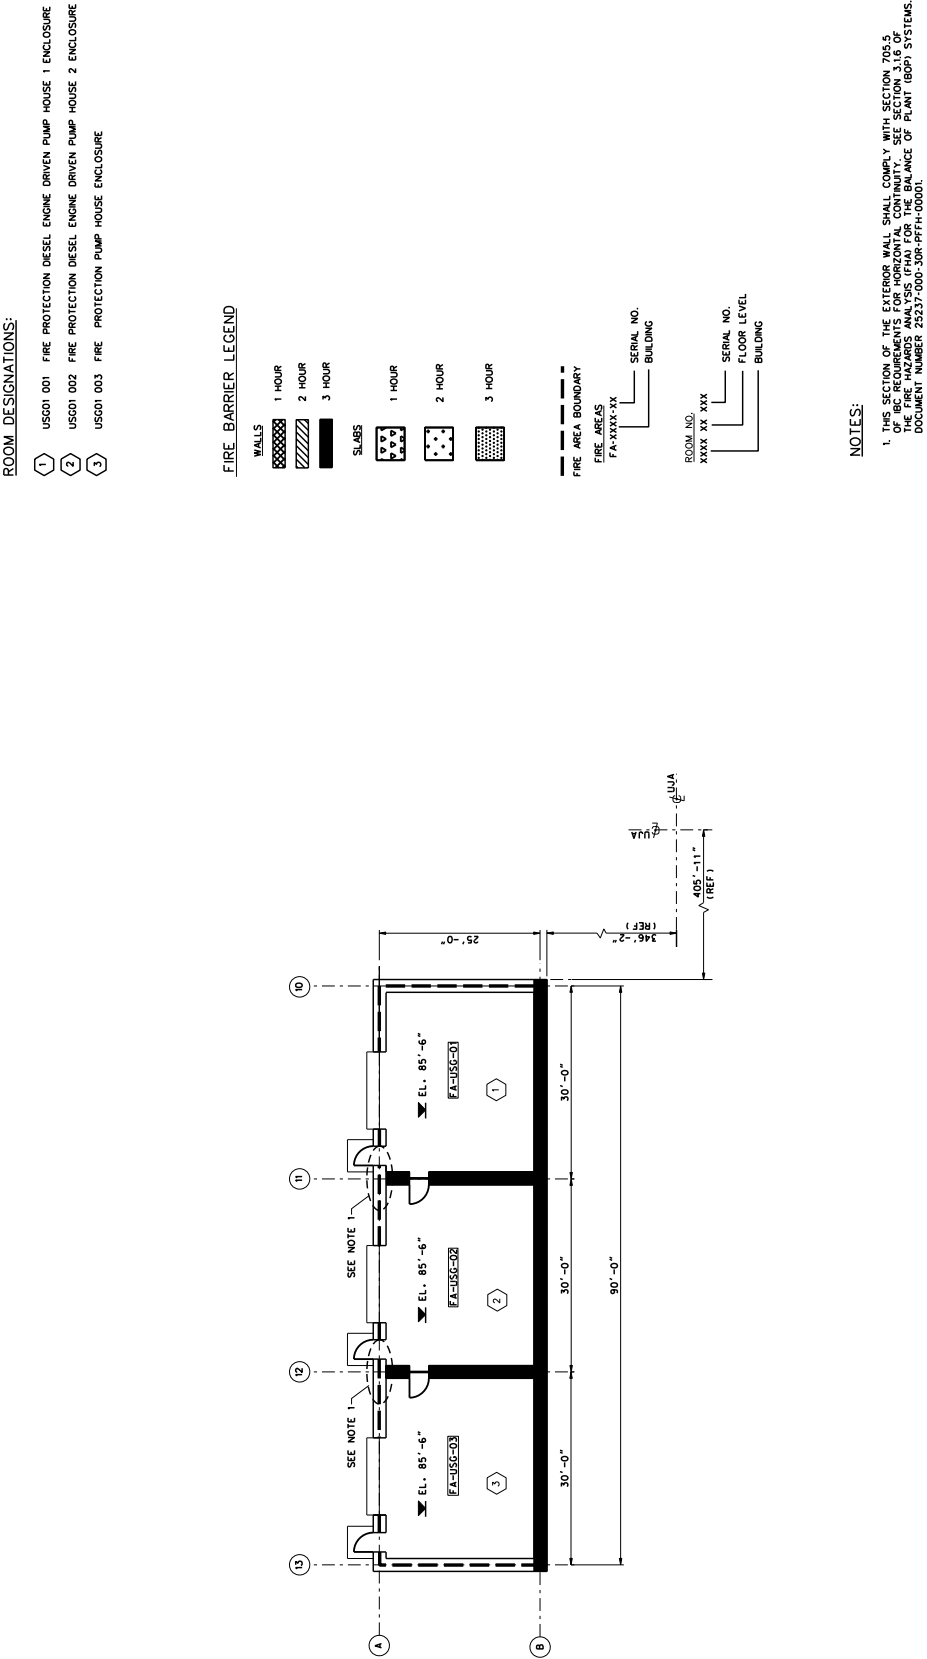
B-21 — {Fire Barrier Location, Plan View and Section A-A}
